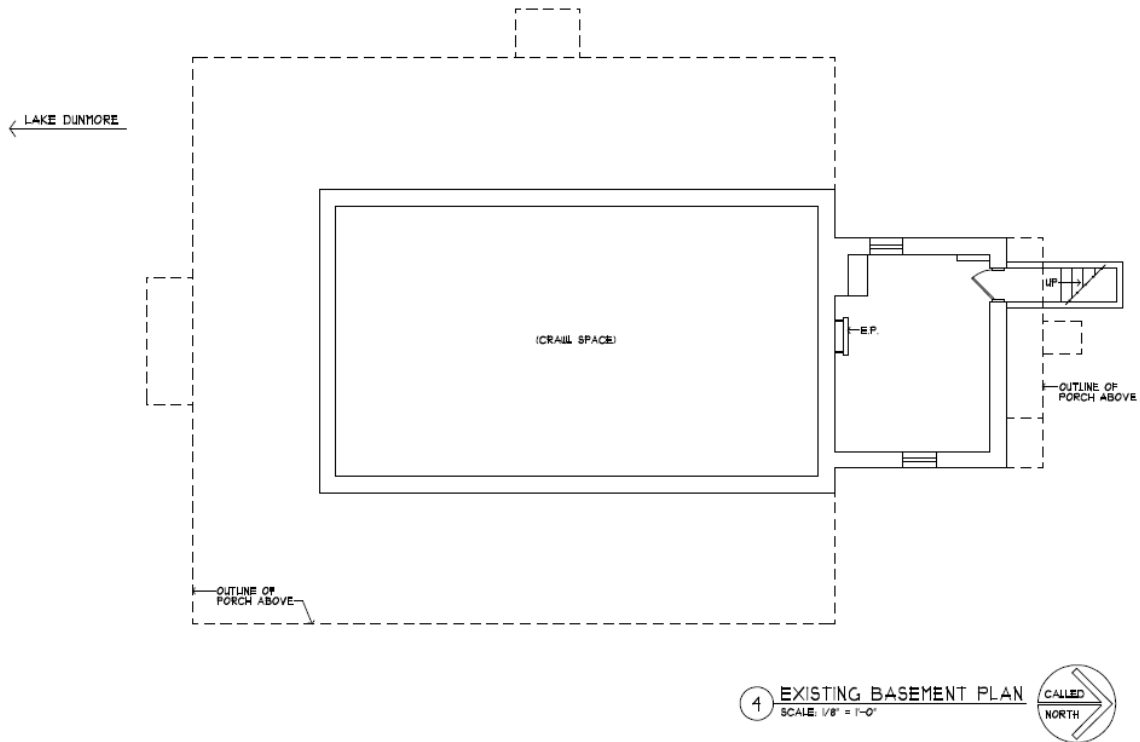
Keewaydin Manor House, existing basement plan (NBF Architects 2016).
